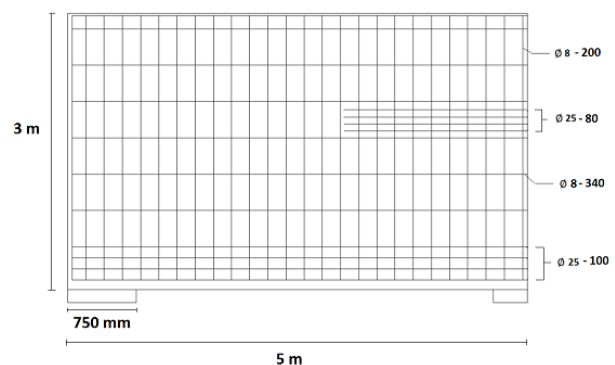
Geometry and reinforcement of half of wall girder model F1 (Model F2 contains no upper tensile tie, this reinforcement is spread out over the web reinforcement)
